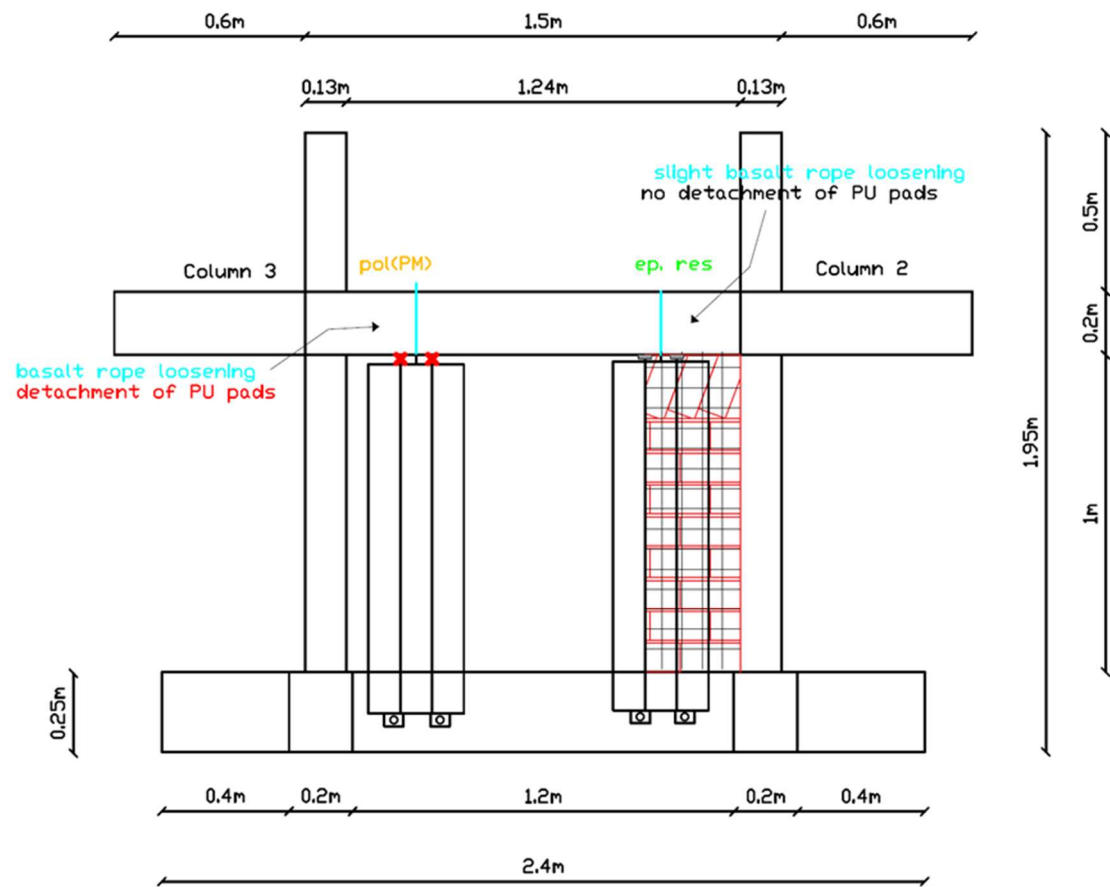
Observed damage after 1.4g test: Living walls LW2-3R showed slight basalt rope loosening allowing micromovements for high direct horizontal loads (severe wind), but no living wall collapse was observed. Left vertical living wall LW2-3L showed basalt rope loosening leading to detachment of PU pads allowing micromovements for low direct horizontal loads (frequent wind) but no living wall collapse was observed.
